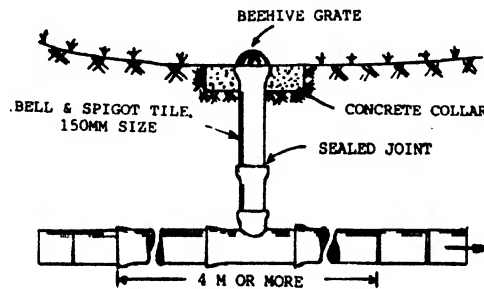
SURFACE INLET FOR PIPE DRAINS
